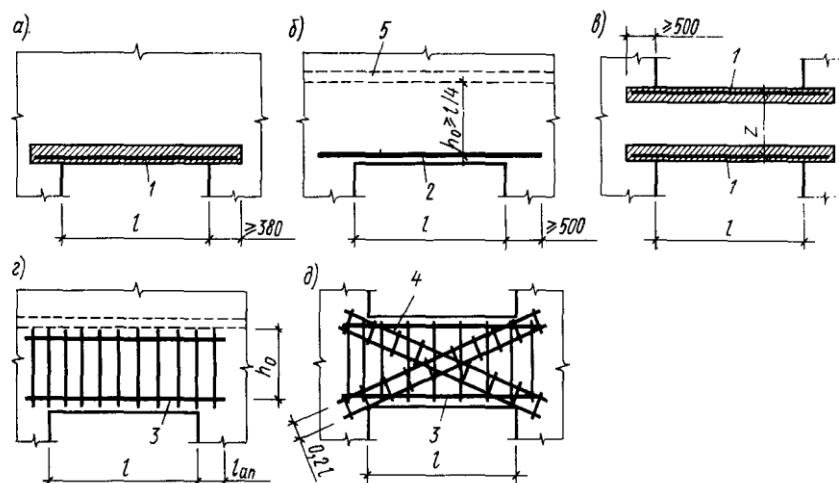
Construction of dams used in stone-brick and concrete walls: 1-prefabricated reinforced concrete element; 2 longitudinal reinforcement placed in a layer of cement mixture; 3- phase horizontal armature test; 4 similarly, placed diagonally; 5-orayopma
